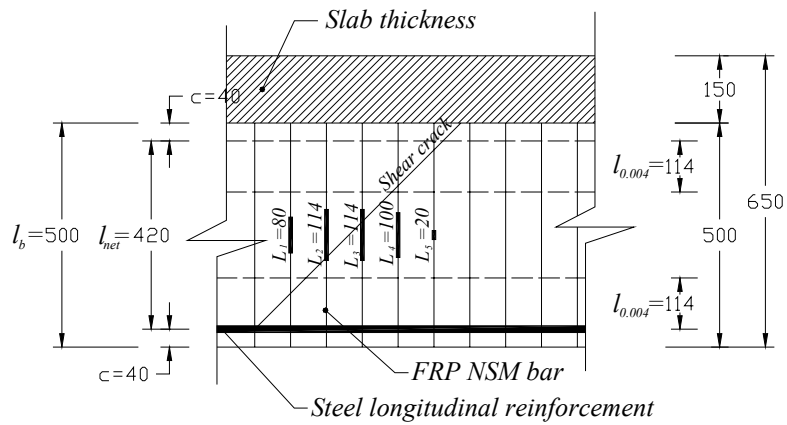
Definition of L_i for a 80 mm Bar Spacing (Only NSM Bars are shown)
